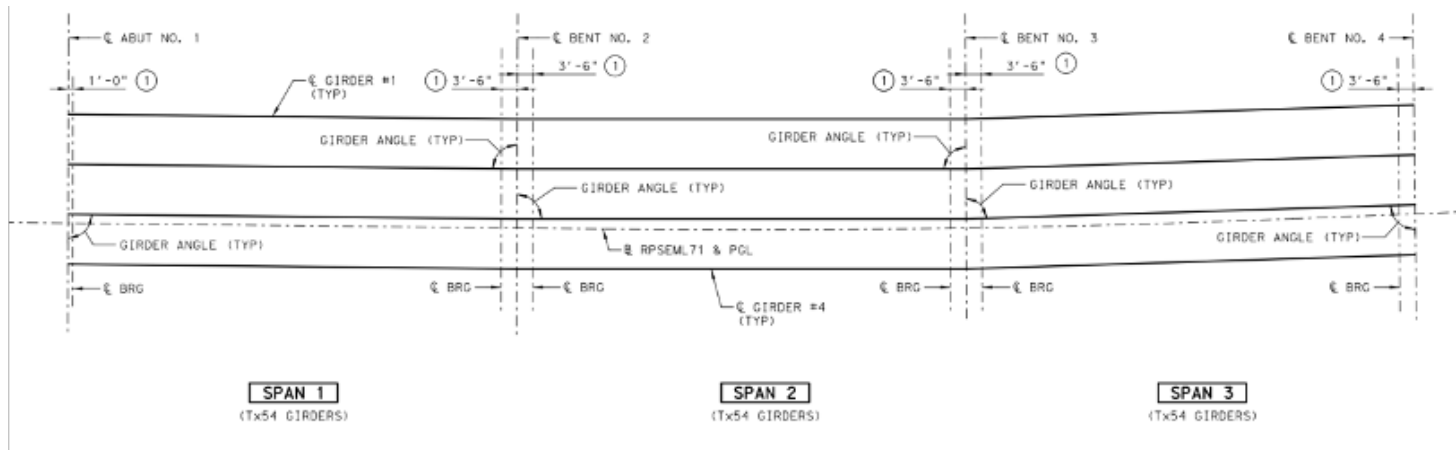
Bridge Spans Example in Highway Project Plans (TxDOT, 2022d)
